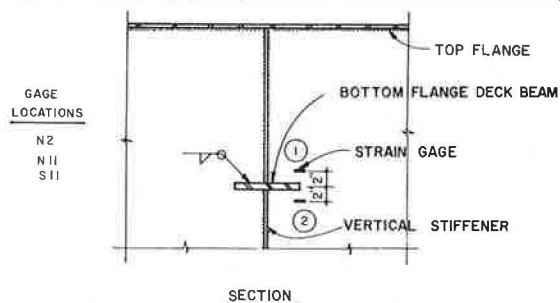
Group J gages at junction of deck beam and web of tie girder.
